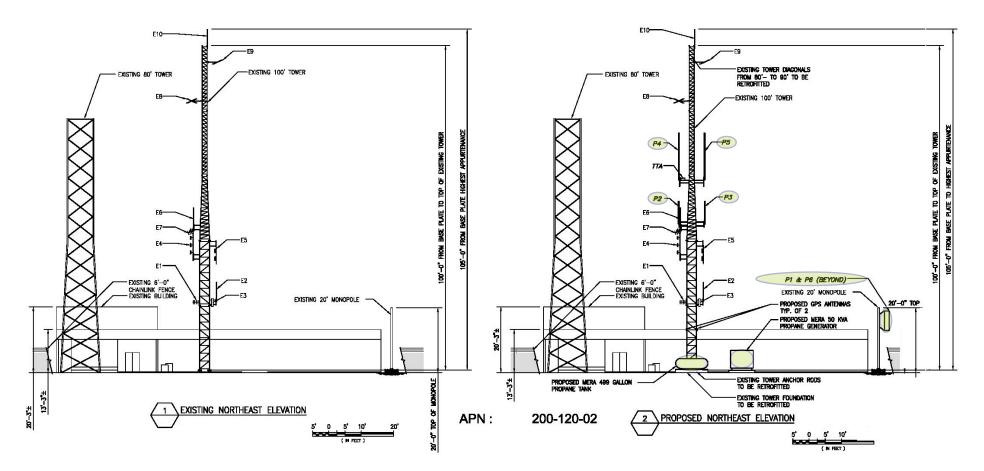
Site 24 - Wolfback Ridge Existing and Proposed Elevations
